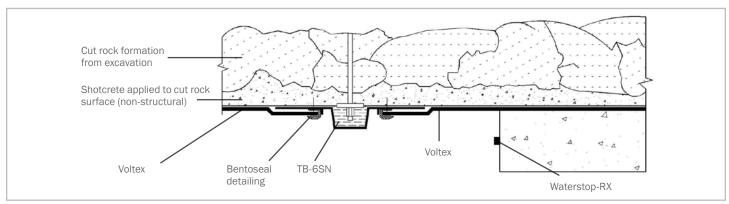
Cut Rock excavation with shotcrete applied to provide a smooth surface for waterproofing installation.
